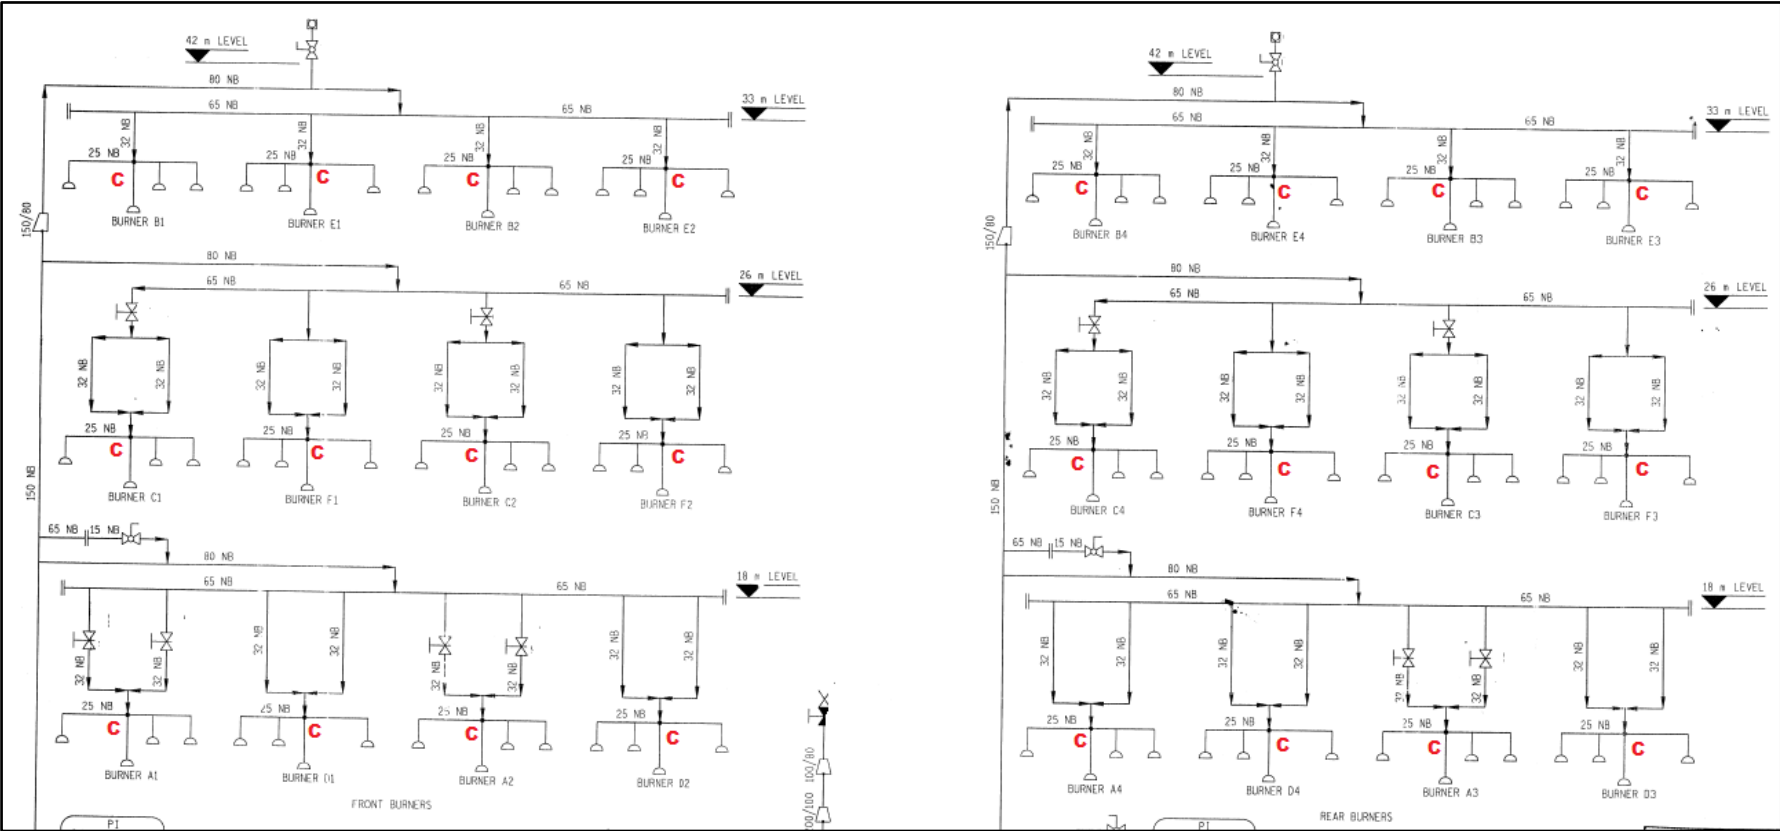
Unit 2 Boiler Burners MJC Locations [52]
